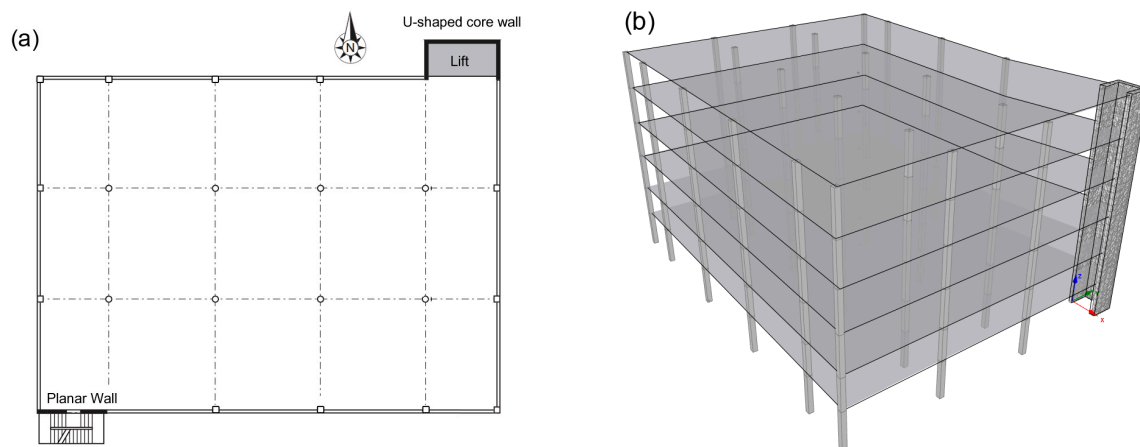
(a) Building plan with an RC U-shaped peripheral core wall (b) three-dimensional (3D) elevation view of an idealized six-story building with a single peripheral RC U-shaped core wall (adapted from SeismoStruct [12]; other structural members, such as beams, are not illustrated).
